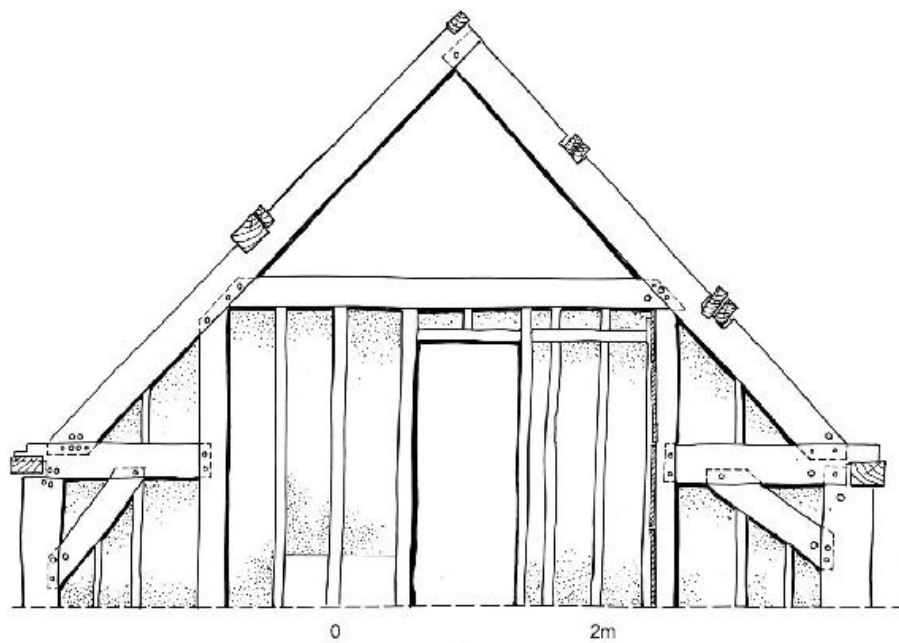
Although later infilled, the top of the western frame of the central range of 14 Church Street appears to have incorporated a very broad opening to maximize ease of access through it. While the opening could have been widened, the carpentry suggests that the interrupted-tie design is primary
